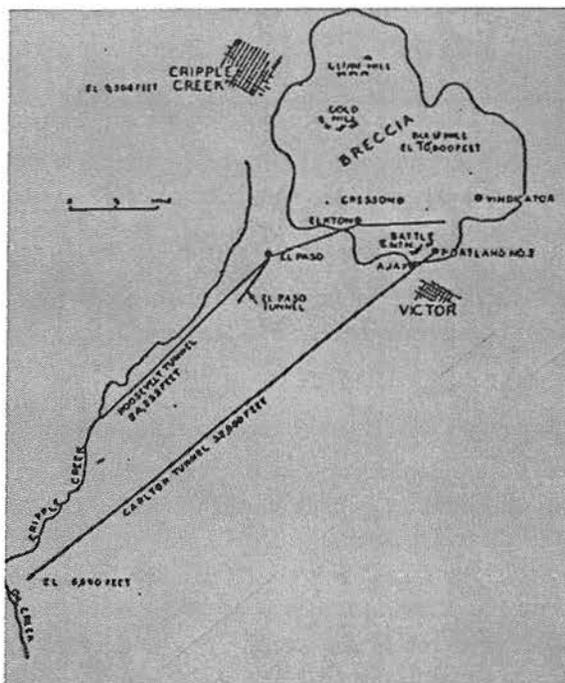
Plan View – Tunnel Location. *Compressed Air*, June 1940.
